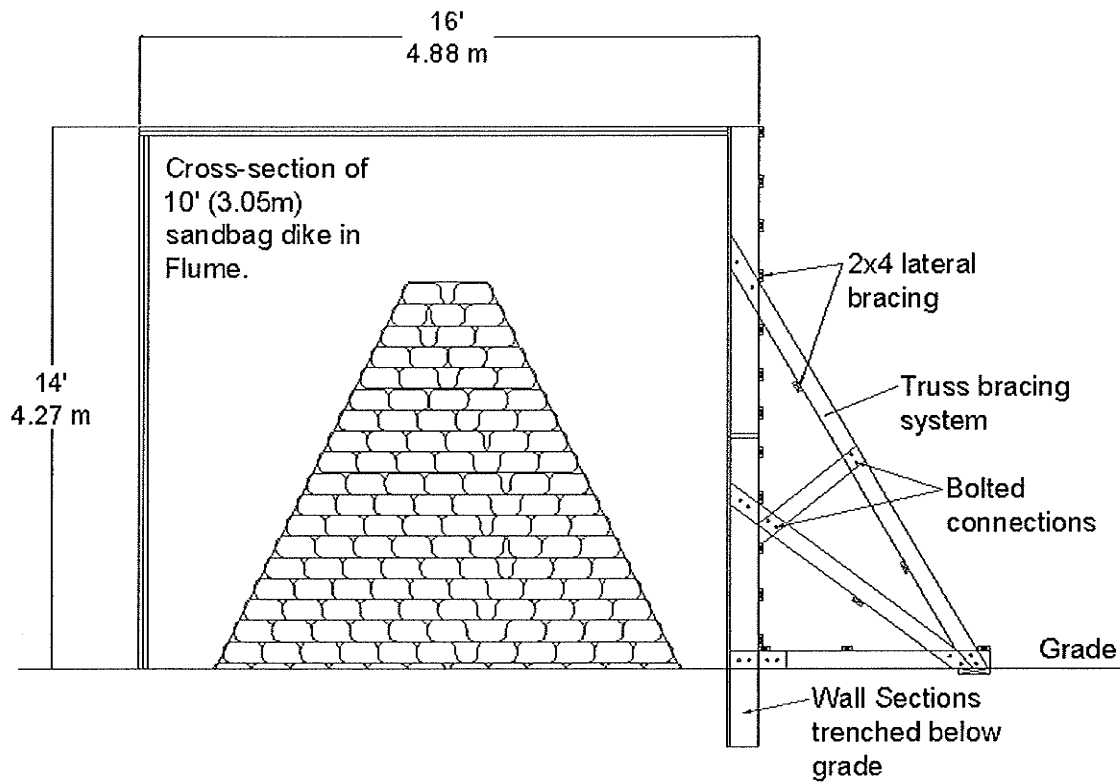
Elevation view Schematic of Flume through North-South cross-section.
